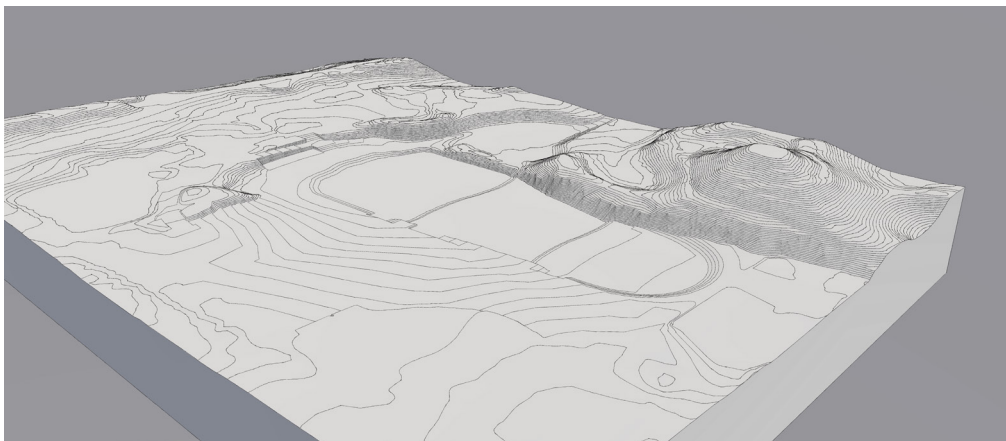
RRA Development Plan – Proposed landform viewed from north-east (3D model by RRA)
